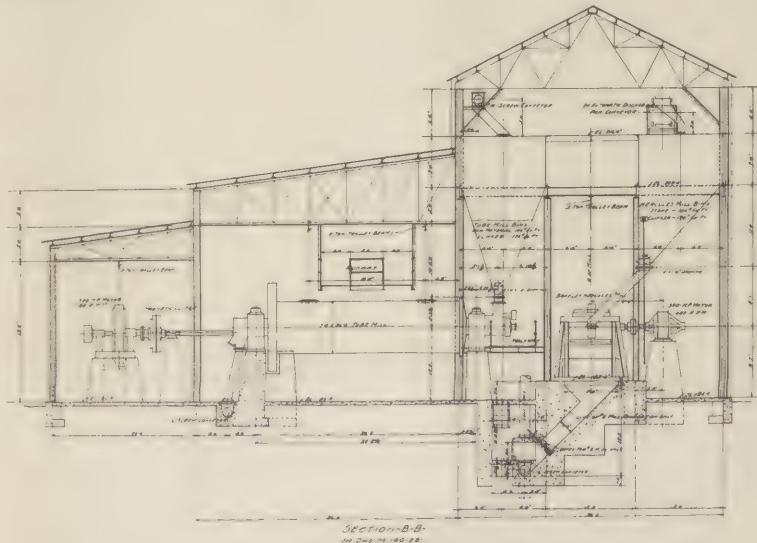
Raw mill—National Cement Co., Montreal, Que., Richard K. Meade & Co., Engineers.
